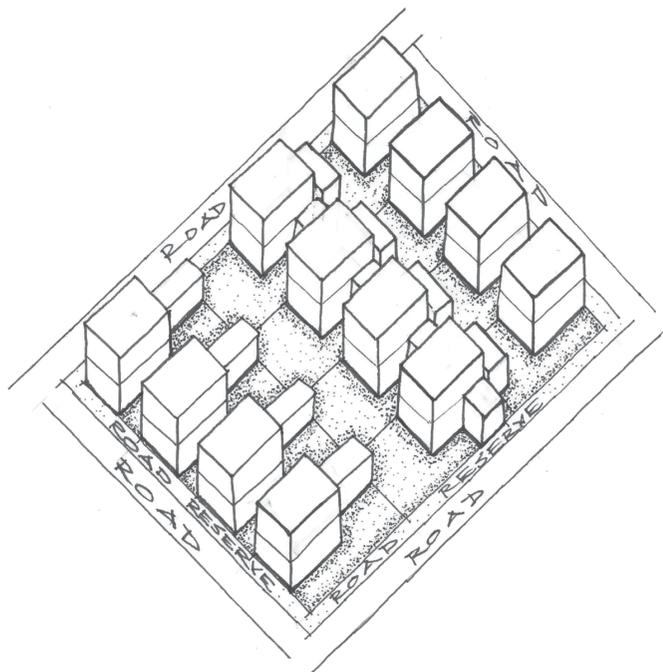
Grouped houses allowing for horizontal (backwards or sideways) and vertical extensions, through the addition of rooms to the two-storey starter house.
